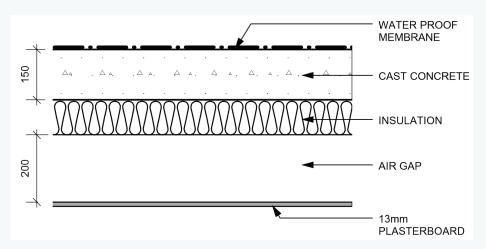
NCC concrete roof build up used in modelling (Source: Authors)
